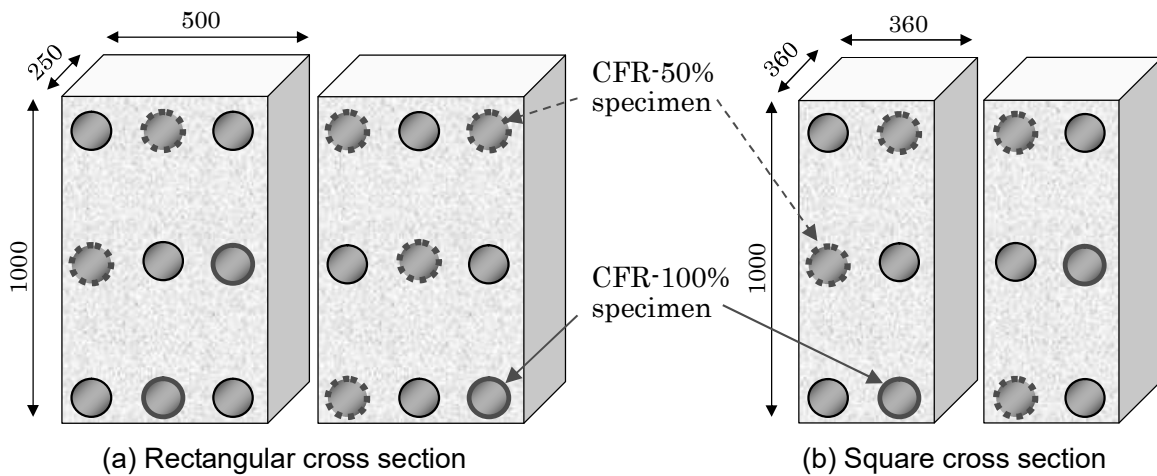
Collection position of carbon fiber sheet reinforcement specimen
